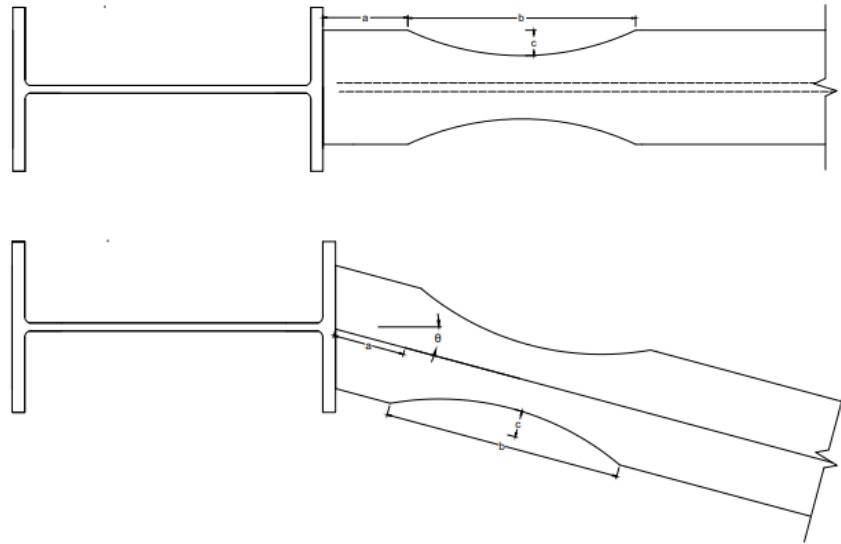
(a) Orthogonal reduced beam section, (b) Skewed reduced beam section.
